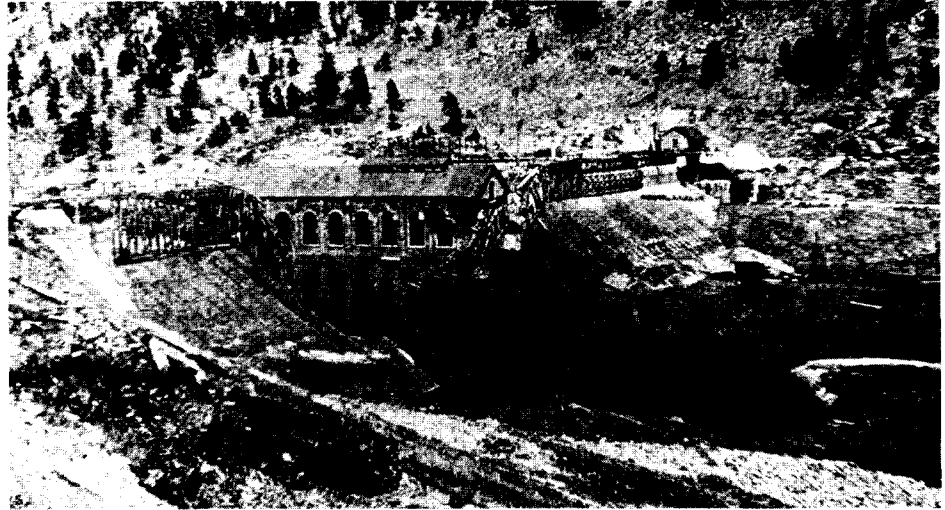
The Hauser Lake dam after April 1908 failure.* From *Engineering News* 59 (April 30, 1908): 491.
